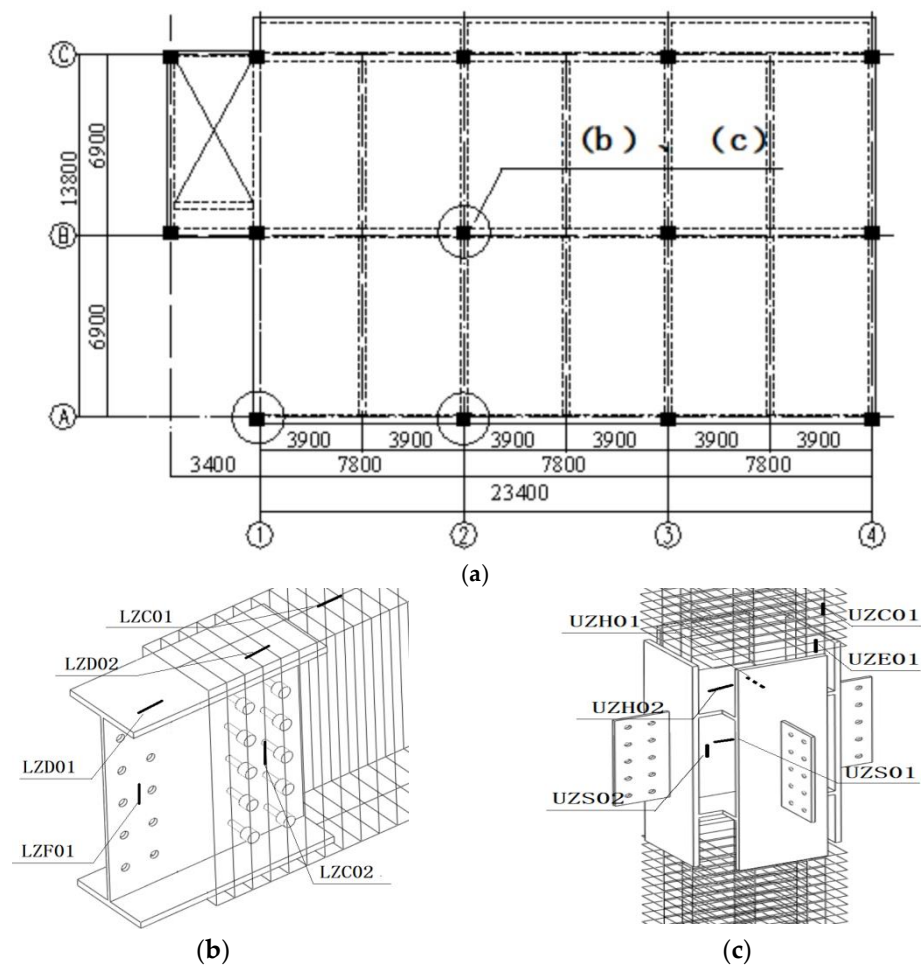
Schematic diagram of the location of measuring points: (a) Floor plan of the building; (b) Layout of the sensor position of the connecting beam end of the center column; (c) Layout of the sensor position of the connecting node in the center column.
